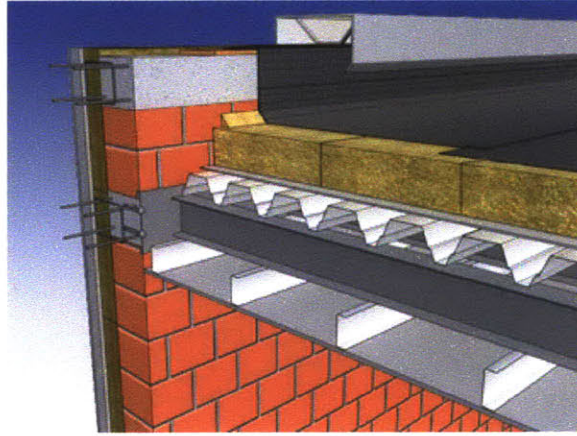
Cross section of a modified-bitumen roof, showing the top coat, bitumen-polymer, waterproofing, and insulation layers. Source [13]
